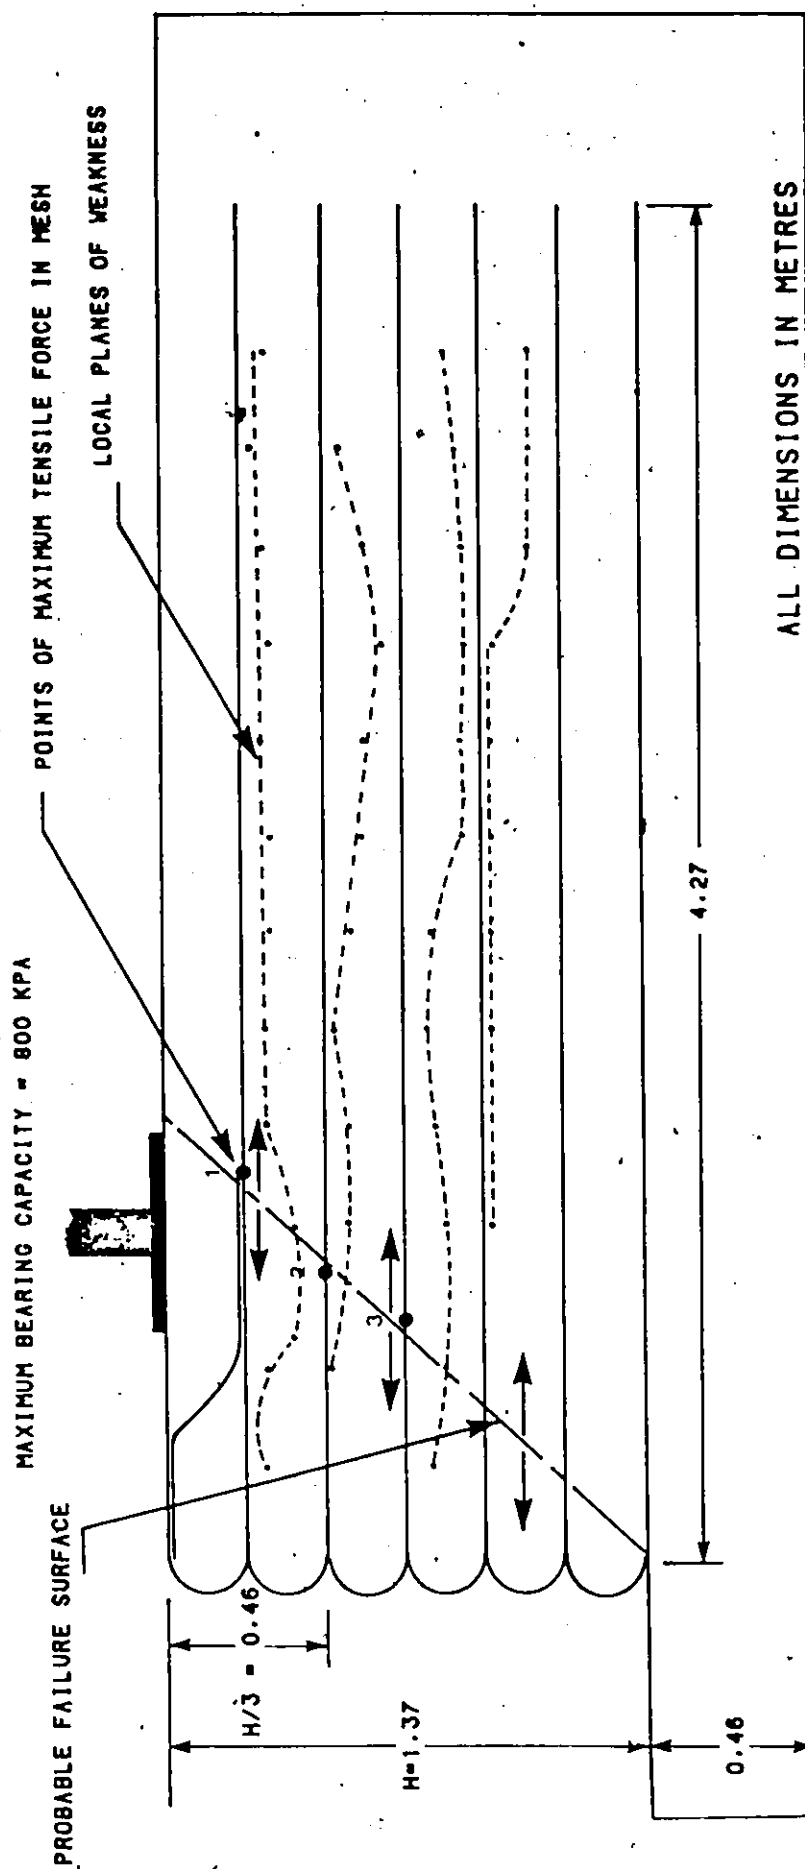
FAILURE SURFACE OF REINFORCED WALL STRUCTURE W-1
